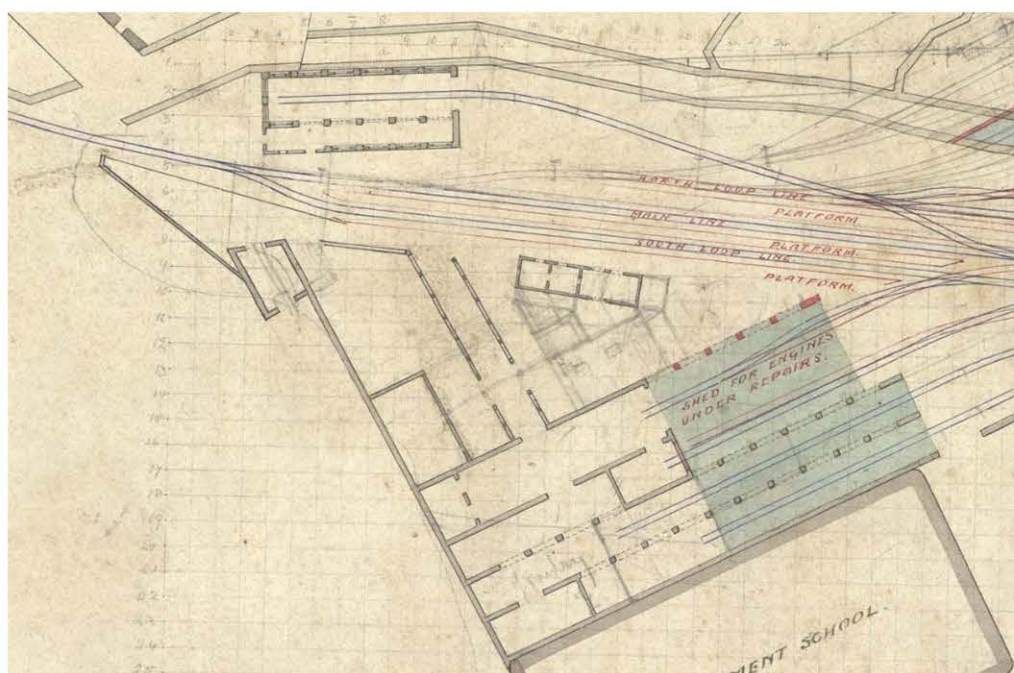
Detail of the Hamrun Central Railway Station plan dated 1897.
